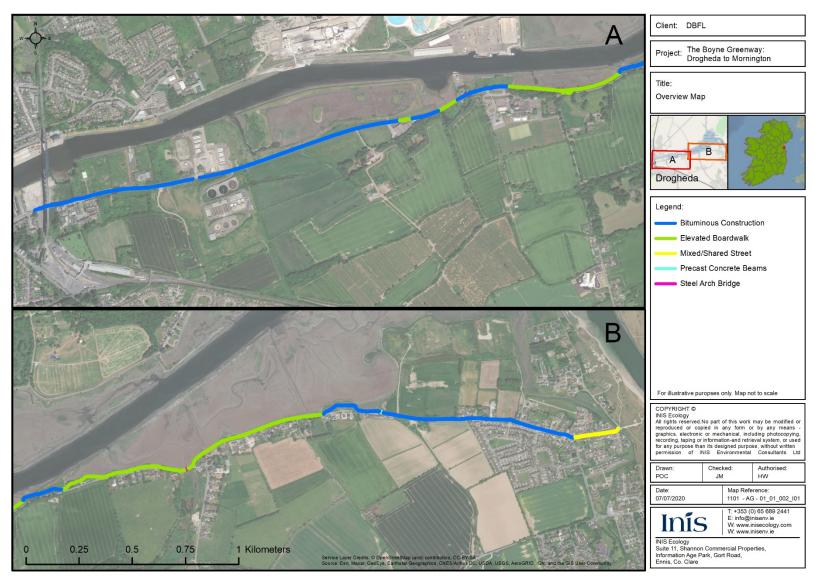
Construction methods for the proposed Boyne Greenway.
